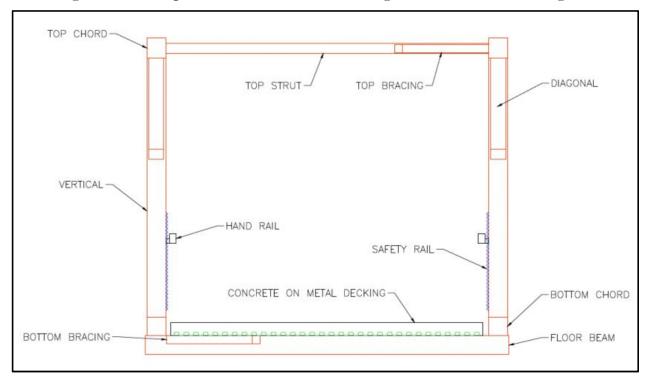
Conceptual Cross Section for Pre-Engineered Steel Truss Bridge
